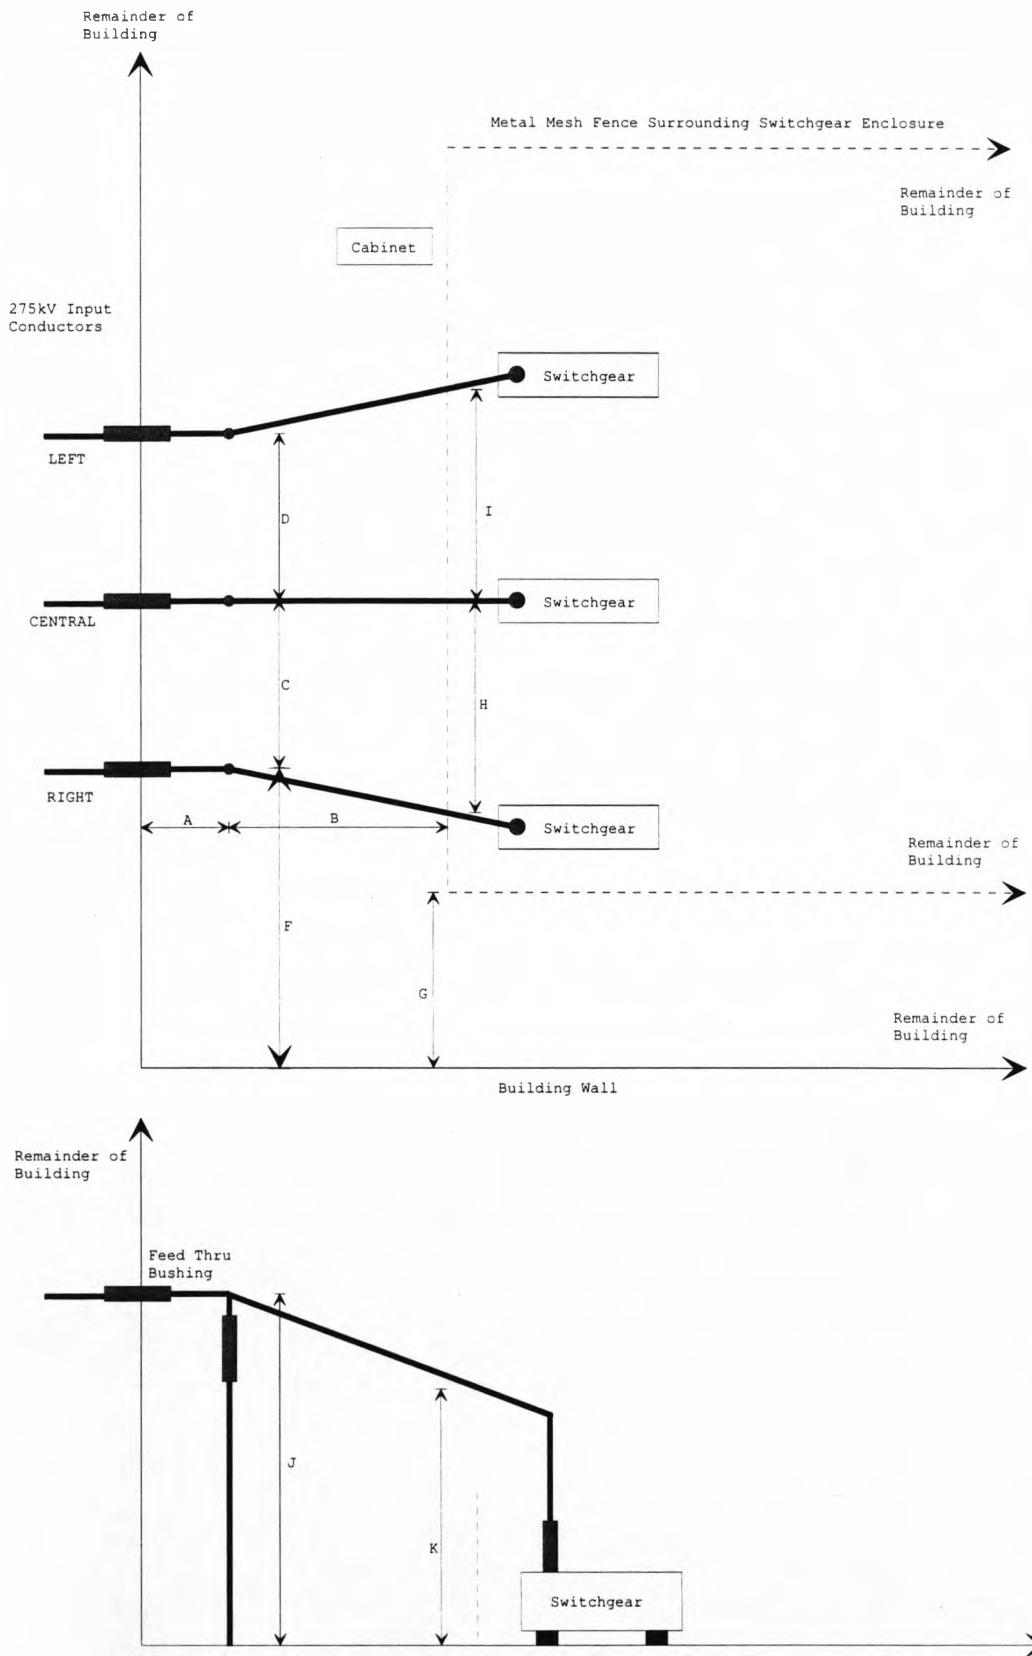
Plan and Side View of Substation Showing Conductor Entry
